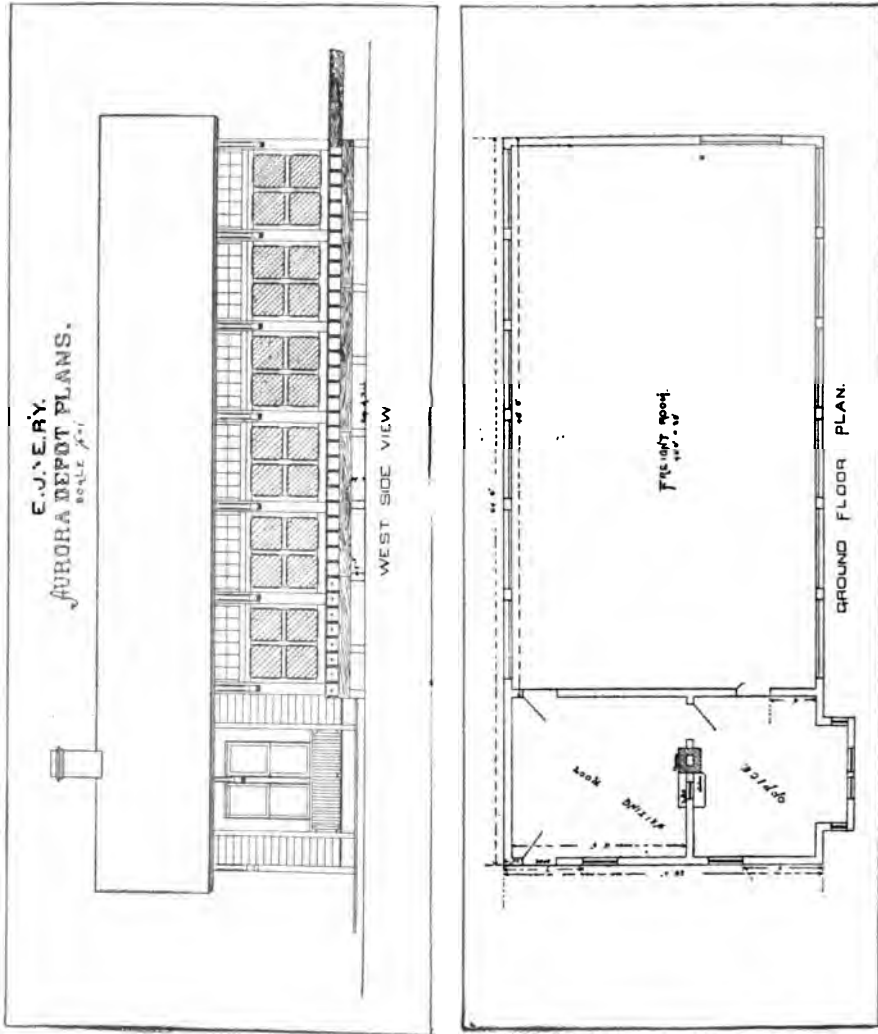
LOCAL COMMINATION DEPOT, ELGIN, JOLIET AND EASTERN R. R. (PLAN NO. 10.)
